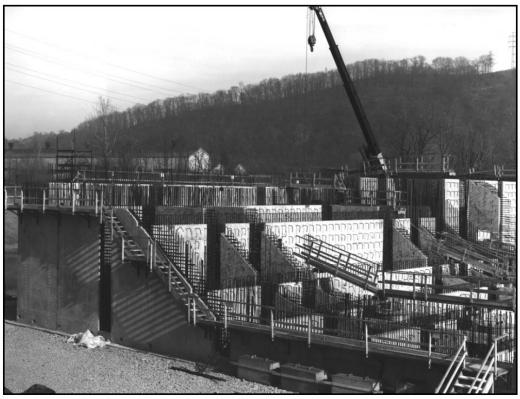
Braddock Dam, Monongahela River. Construction of dam segment in casting basin.
